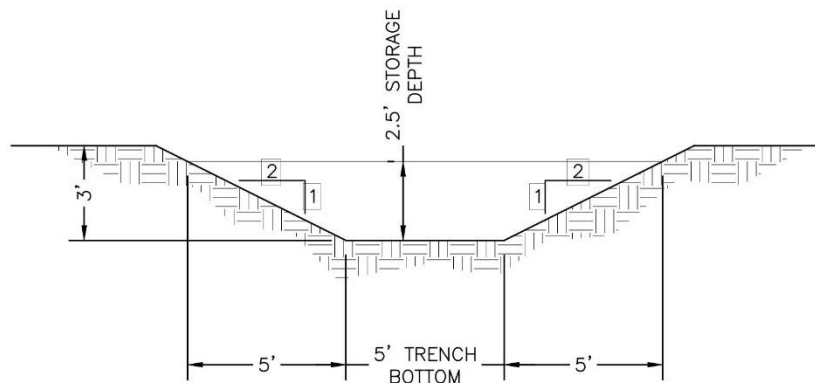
Proposed Drainage Swale/Detention Pond cross-section.
